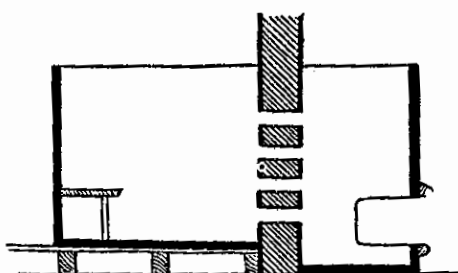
BATH-TUB IN SECTION, WITH OVEN OUTSIDE THE ROOM.
